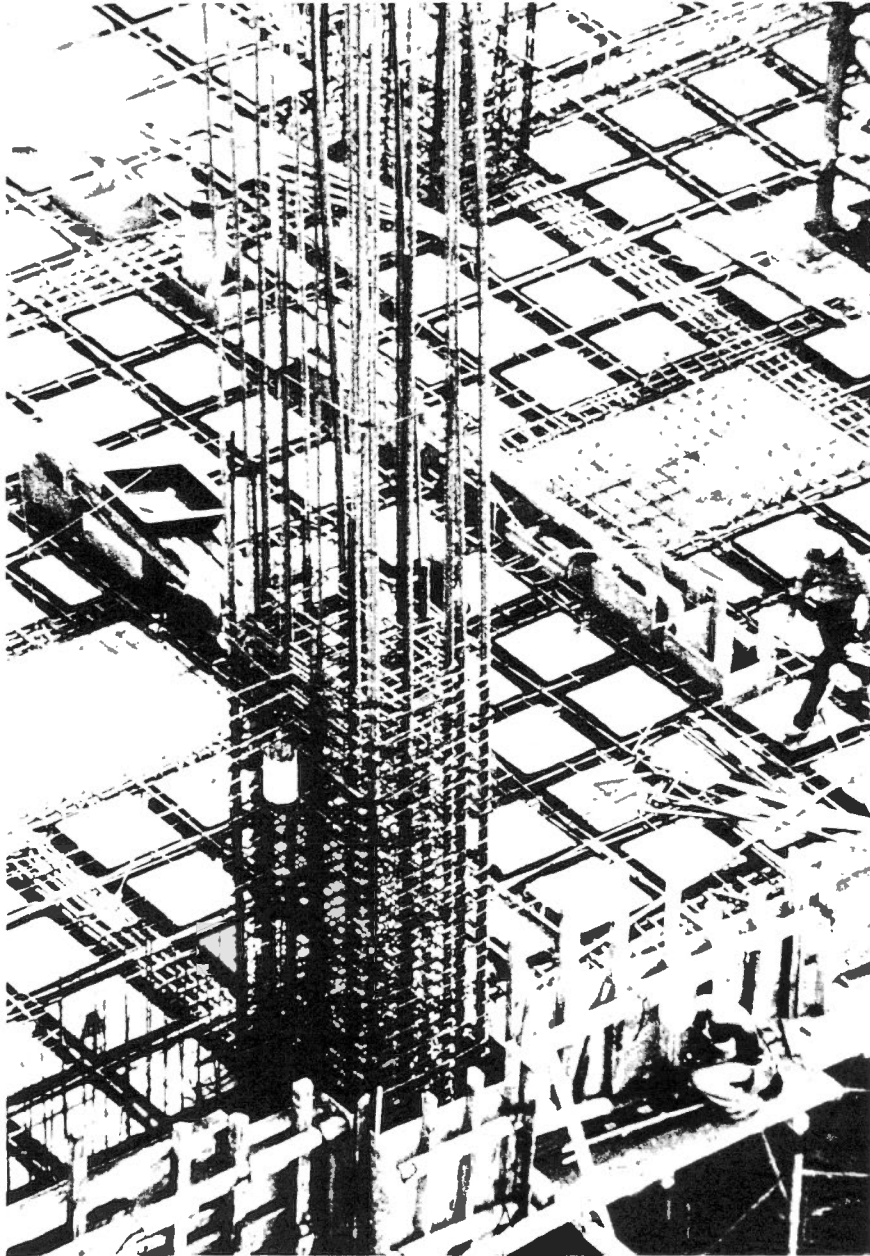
Nikko Hotel Under Construction Showing Typical Waffle Slab Construction
